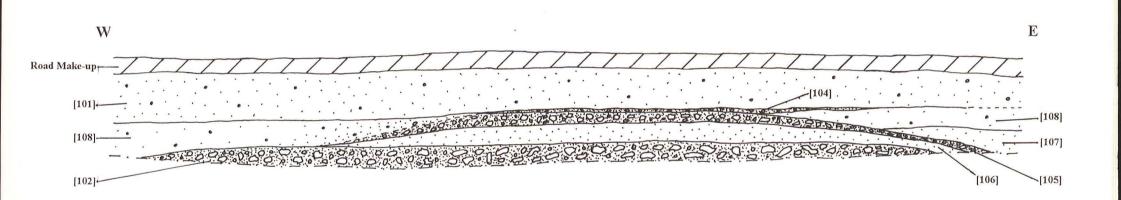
Section through Ermine Street at point of intersection with Heath Road, Coleby (scale 1:20)
